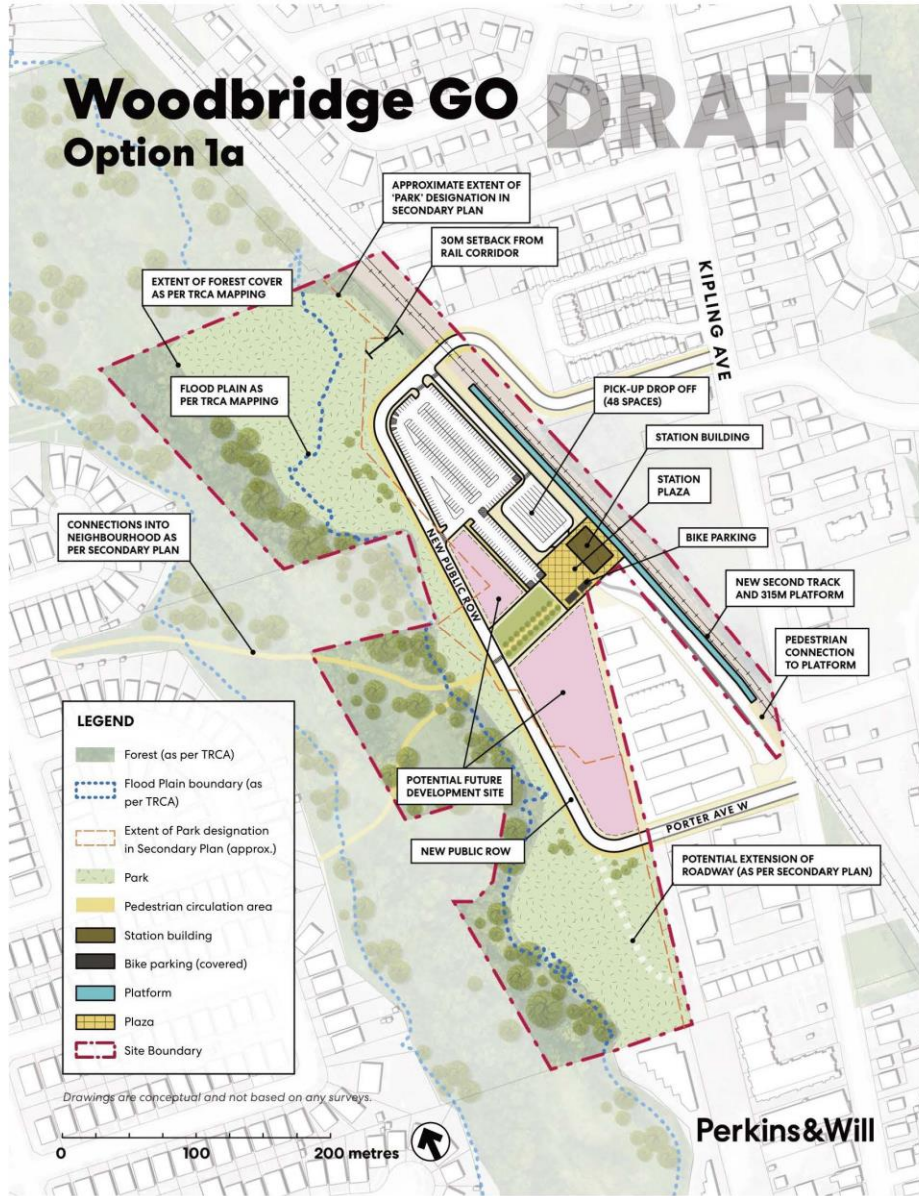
Option 1a conceptual plan for Site 1 and Woodbridge GO Station
